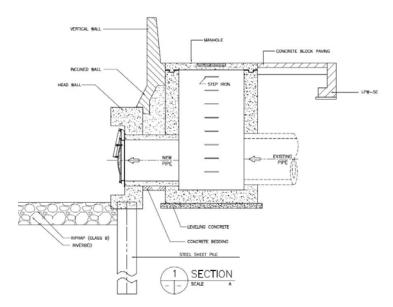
Typical Section of Drainage Outlet Works
